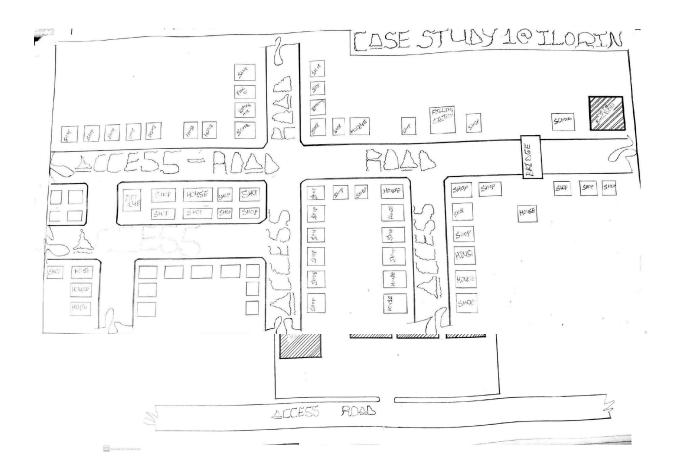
SHOWING THE SITE PLAN OF CASE STUDY ONE
